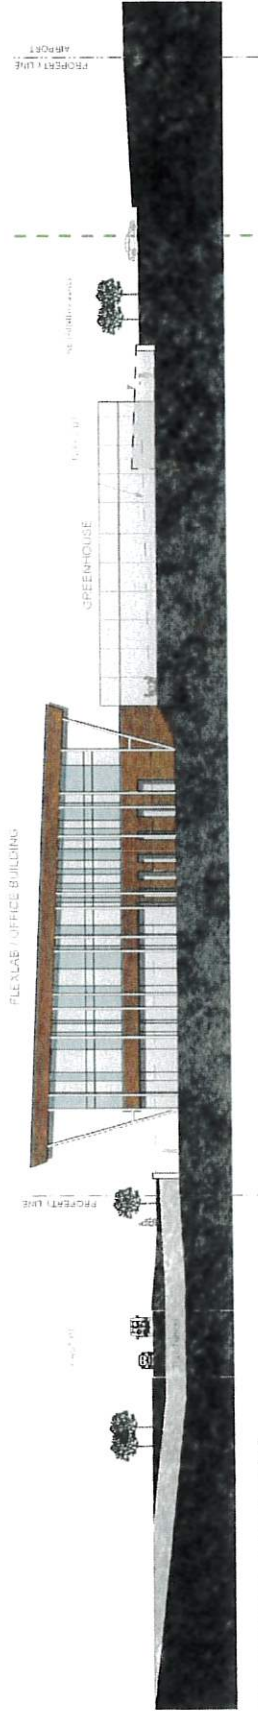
EXHIBIT B - CONCEPT PLAN (2 OF 3)
